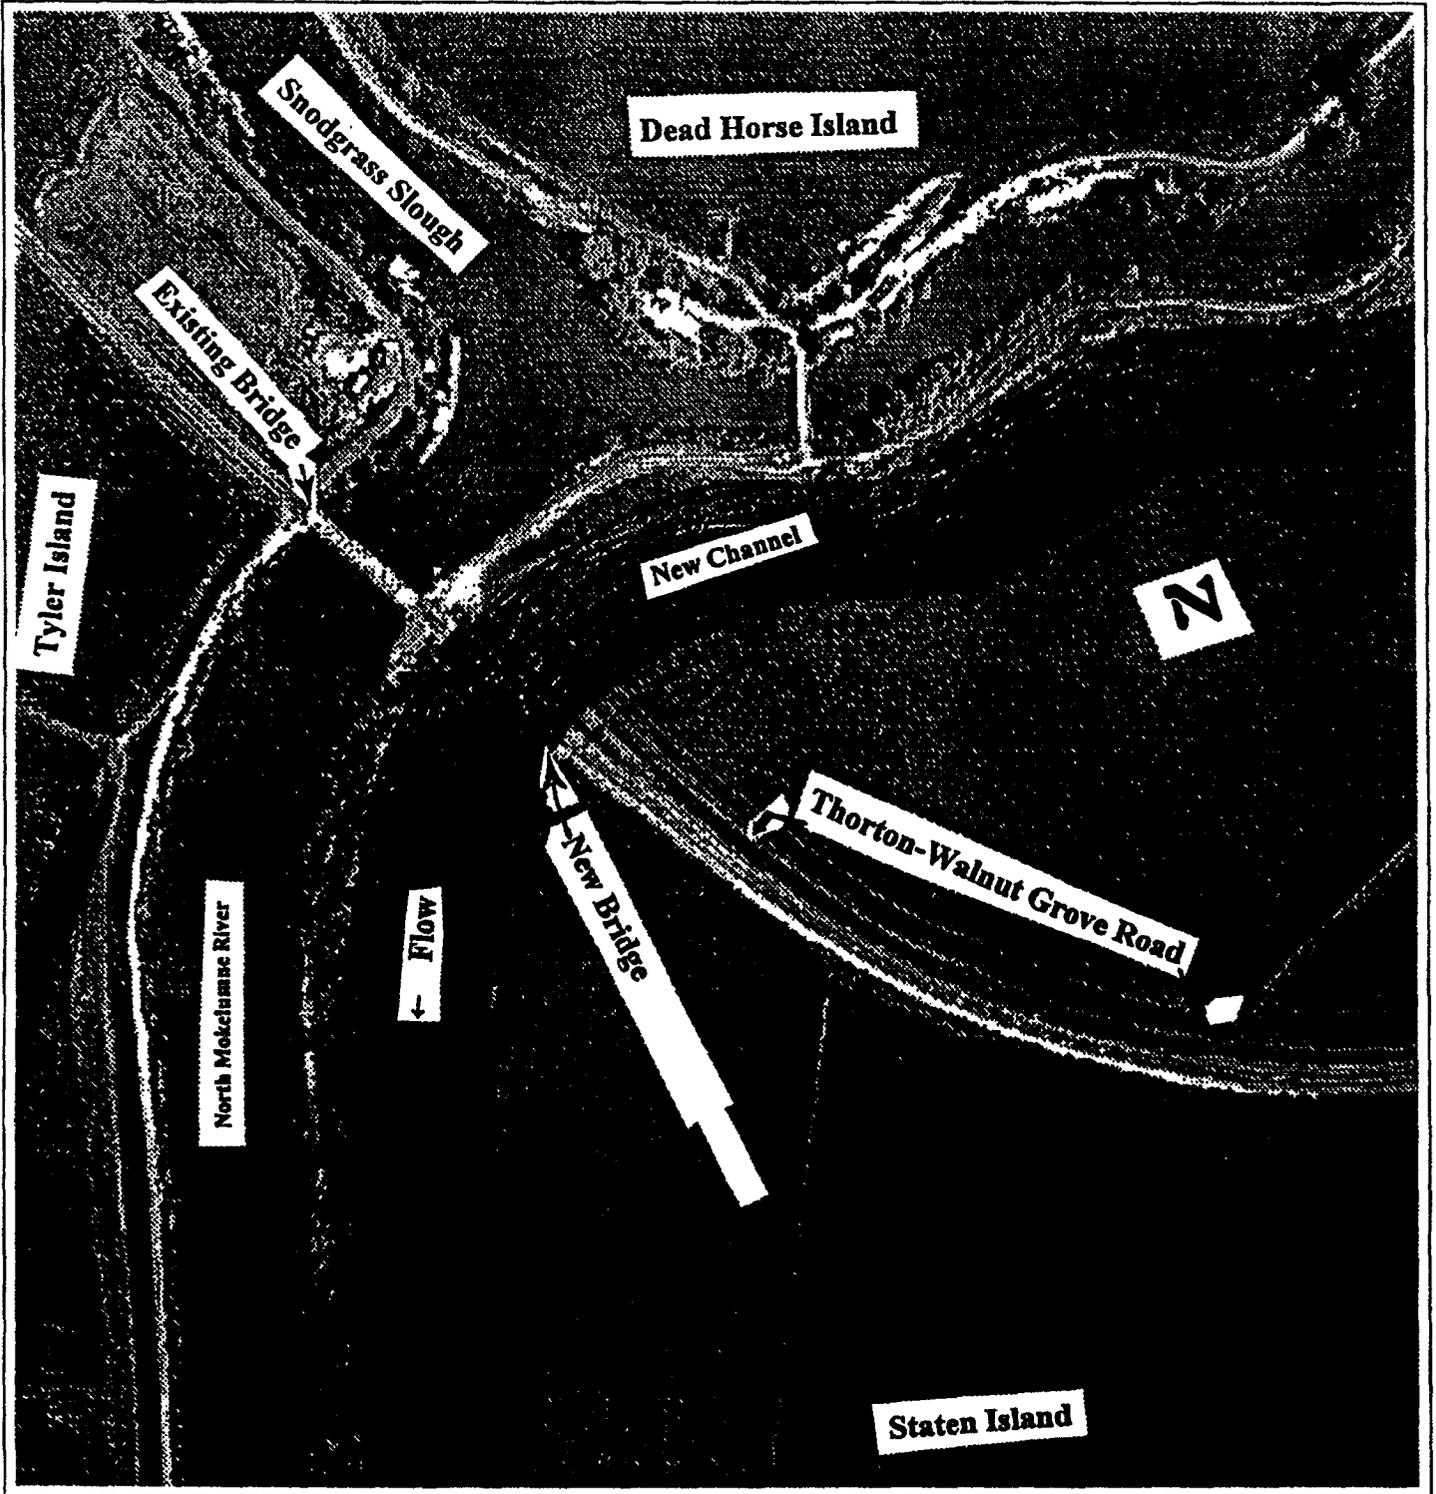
New Two-Lane Bridge on Thornton-Walnut Grove Road
